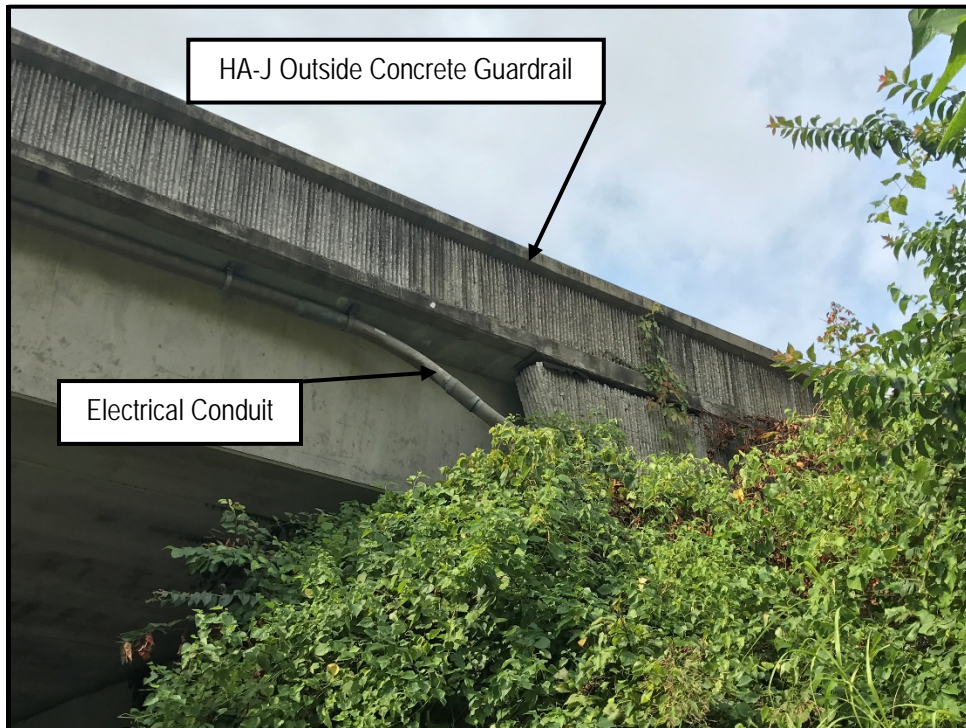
View of HA-J and electrical conduit on the eastbound I-440 bridge over Lealand Lane
